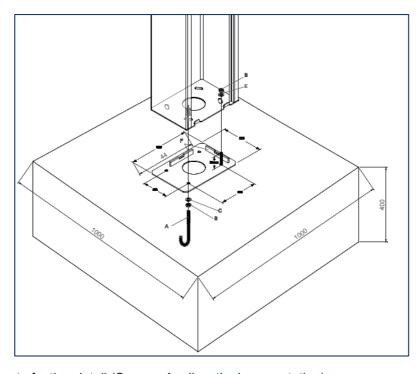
| Boom gate footing detail (Source: Applicant's documentation)
